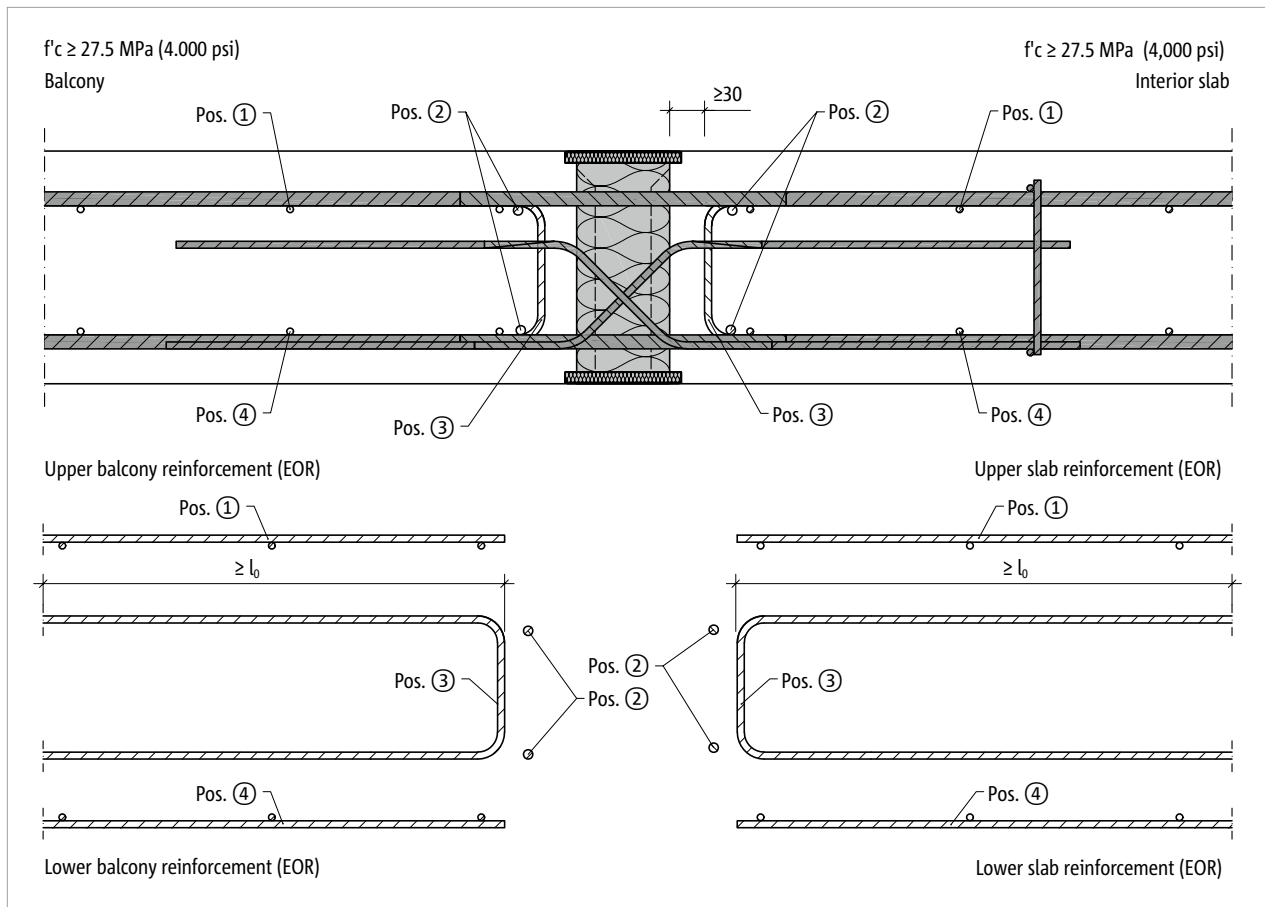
Schöck Isokorb® T Type CD: Cross section of recommended cast-in-place reinforcement (supplied by others)
